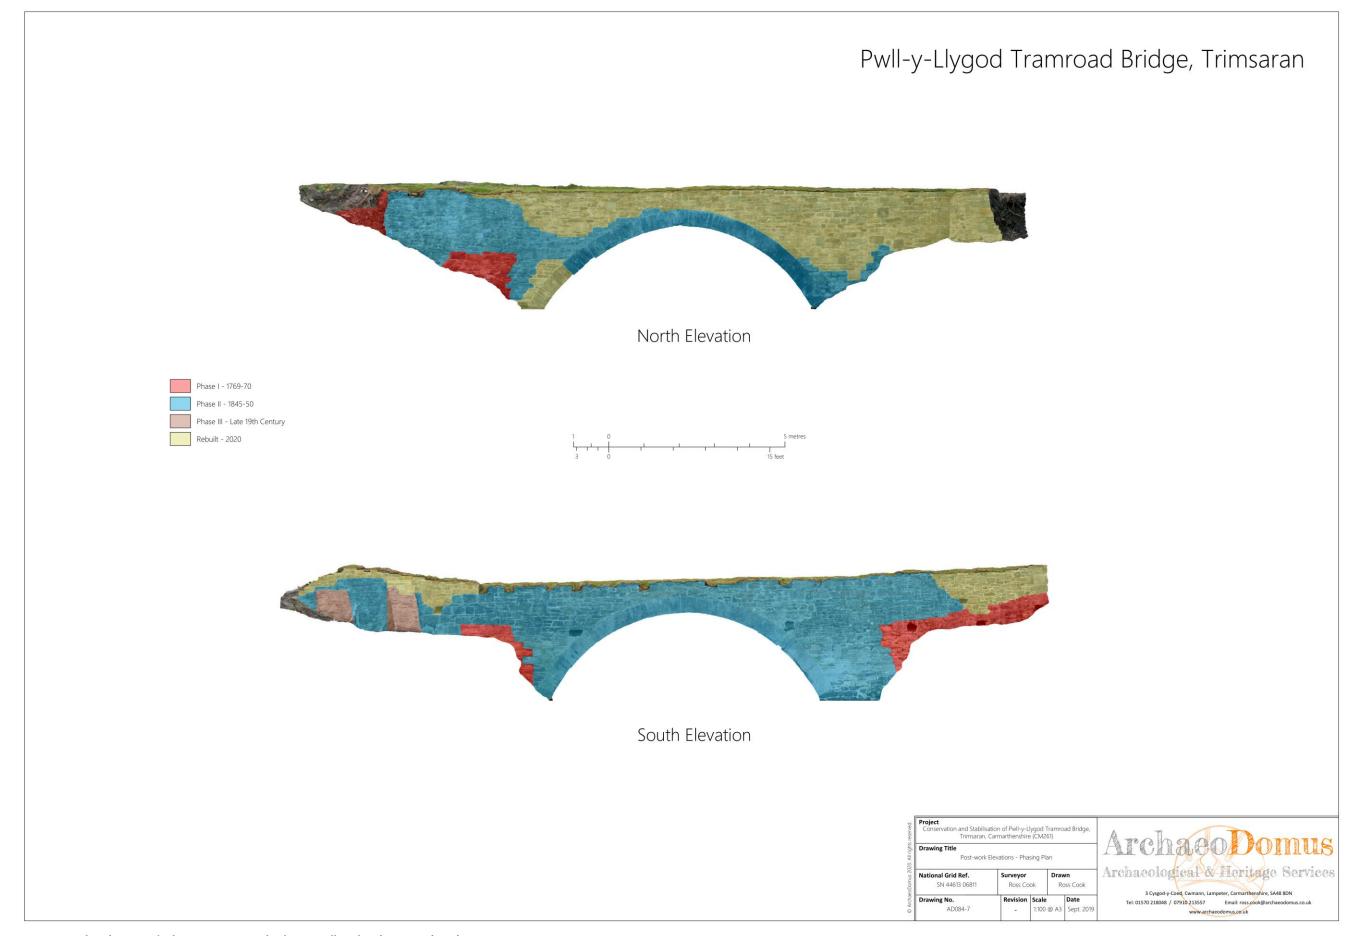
Phased post-work photogrammetric orthoplanes, Pwll-y-Llygod Tramroad Bridge.
